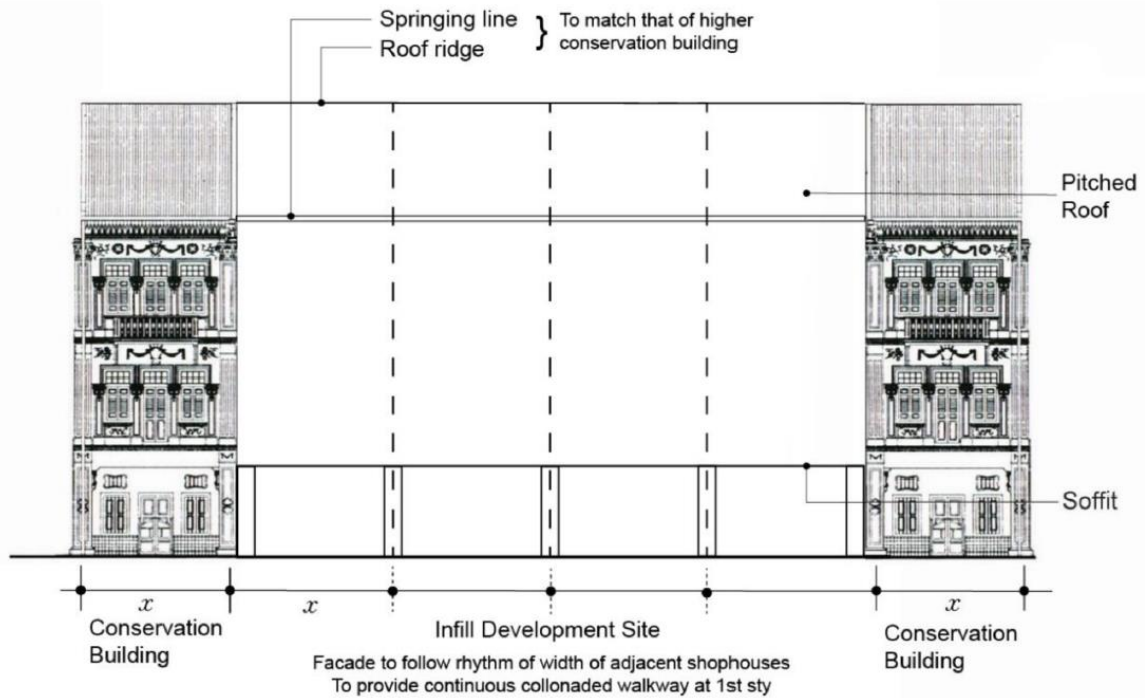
Revised guidelines for façade articulation of Type 2 Infill Site
